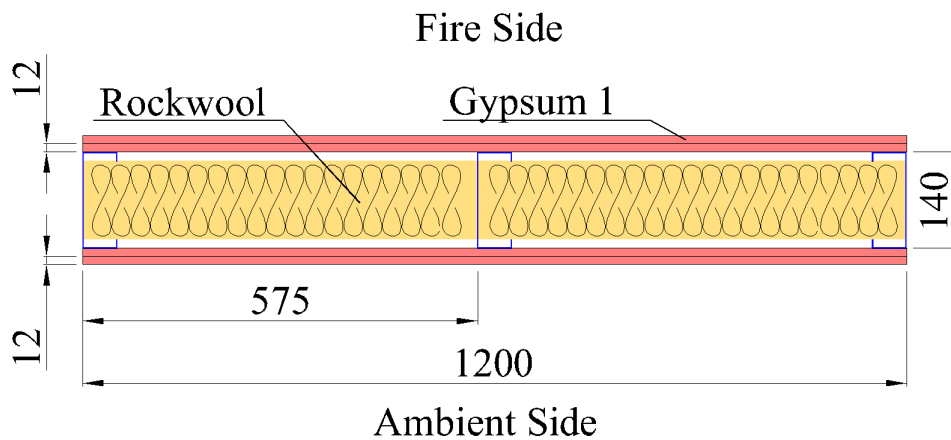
Cross section of wall specimen "S1" and "S5".
